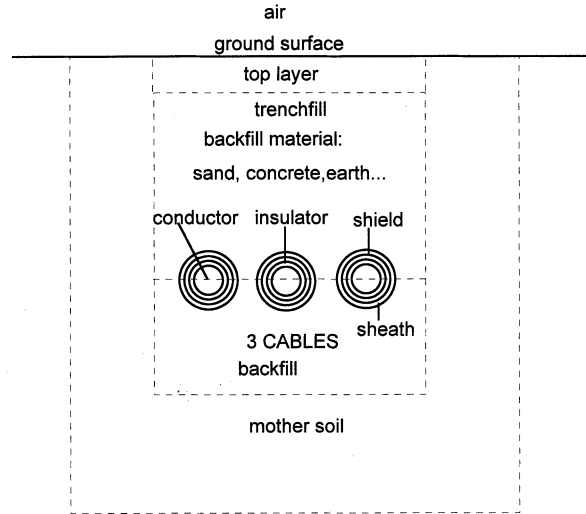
Geometric model (cross-section) of a typical buried cable installation.
